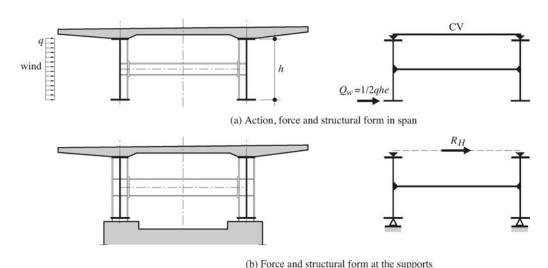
Action due to wind, and structural form for the cross bracing of a twin girder bridge.
